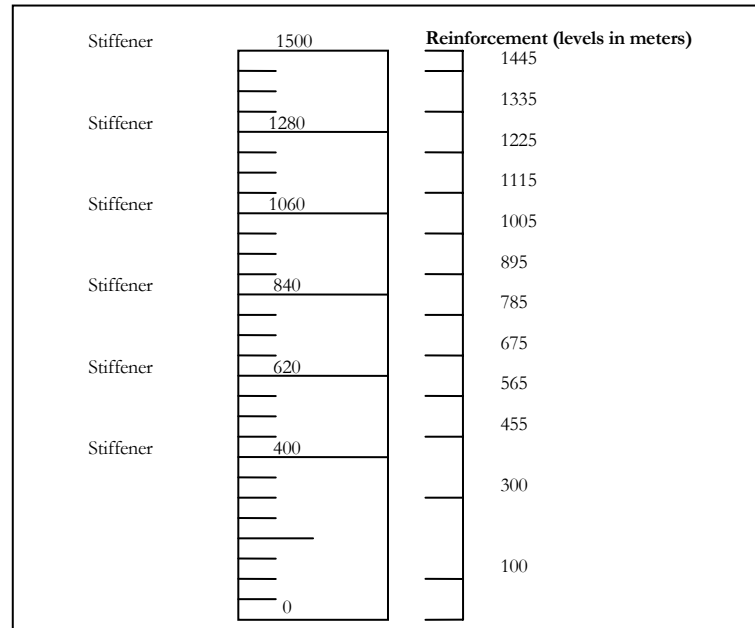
The stiffener and reinforcement layout of the solar chimney.
